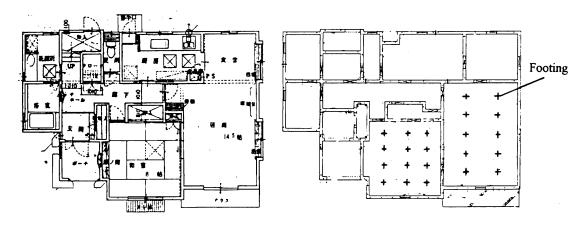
Main Floor and Foundation Plan in Japan (Source: Tokyu Construction Ltd, 1997)
